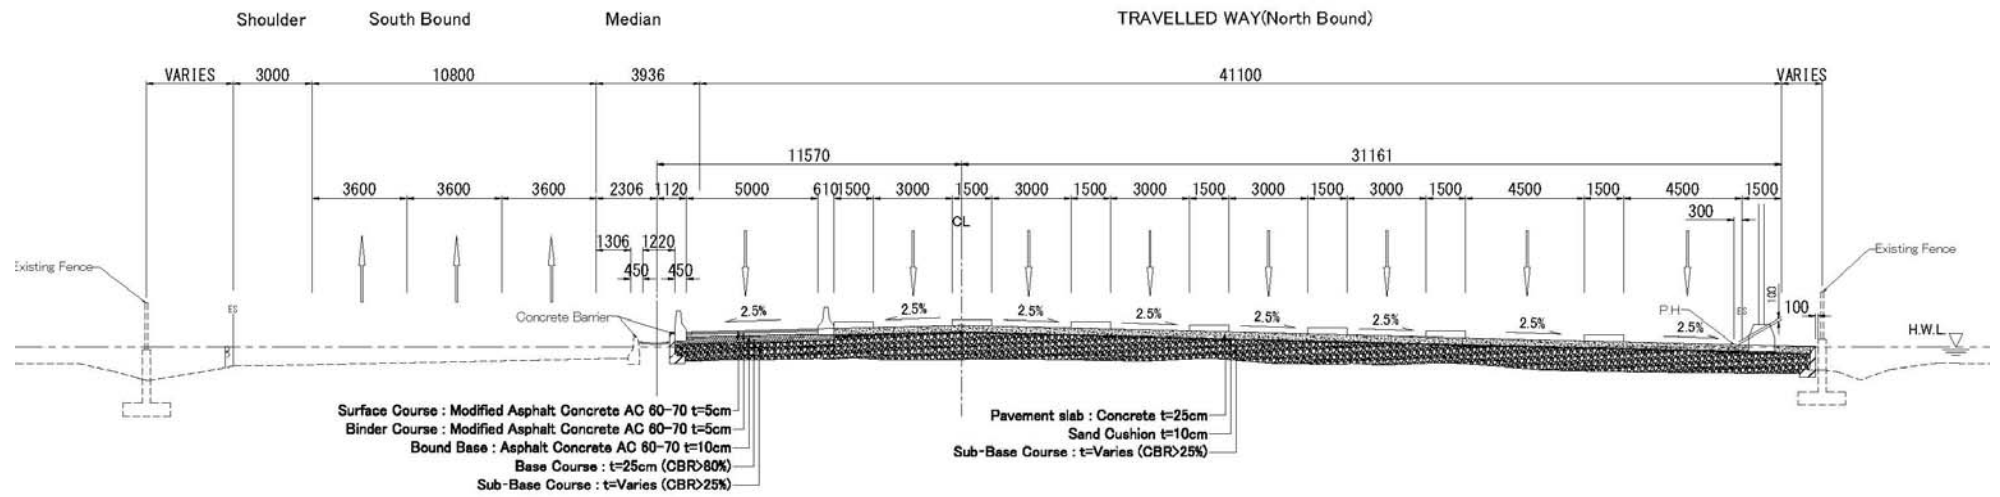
Typical Cross Section (Toll Gate Area)
